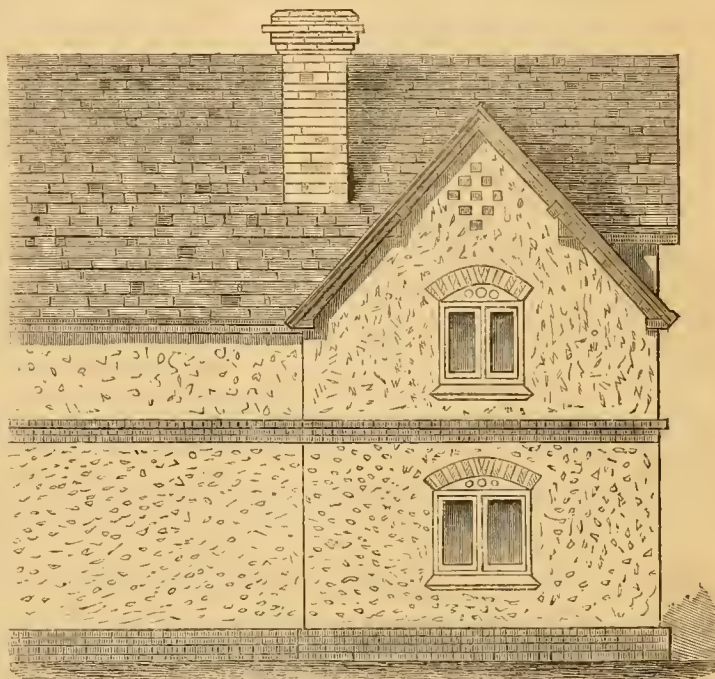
CONCRETE COTTAGE WITH BRICK ORNAMENTS.
